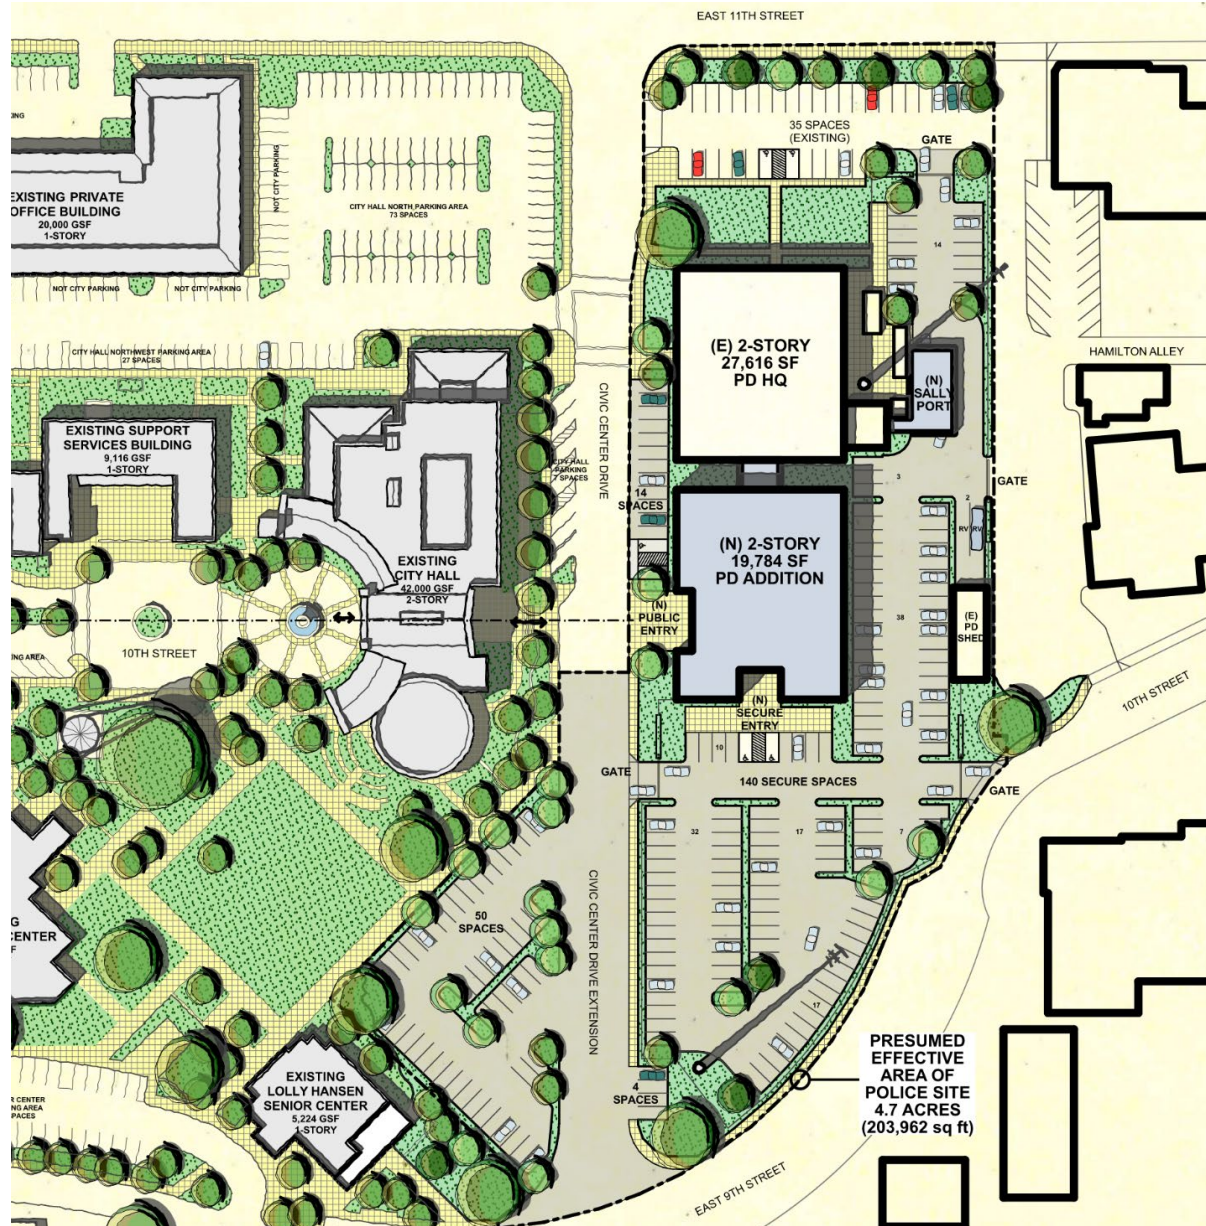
Civic Center Expansion of Police Building and Site (at Horizon Year 2040)
